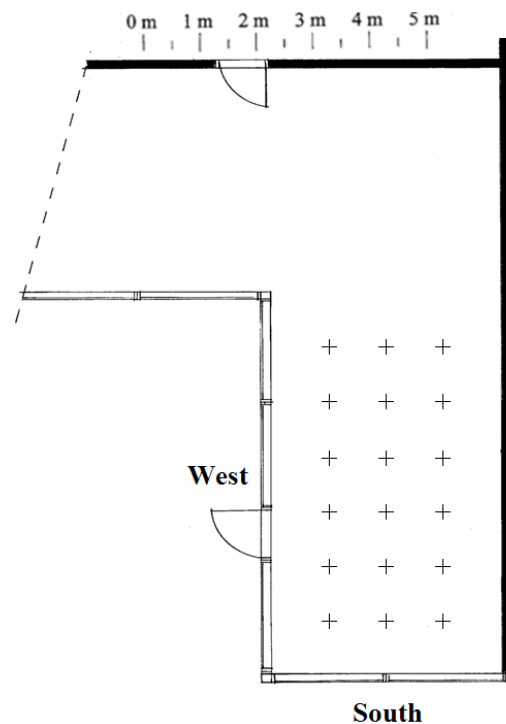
Modern south/west facing apartment with windows from floor to ceiling.
